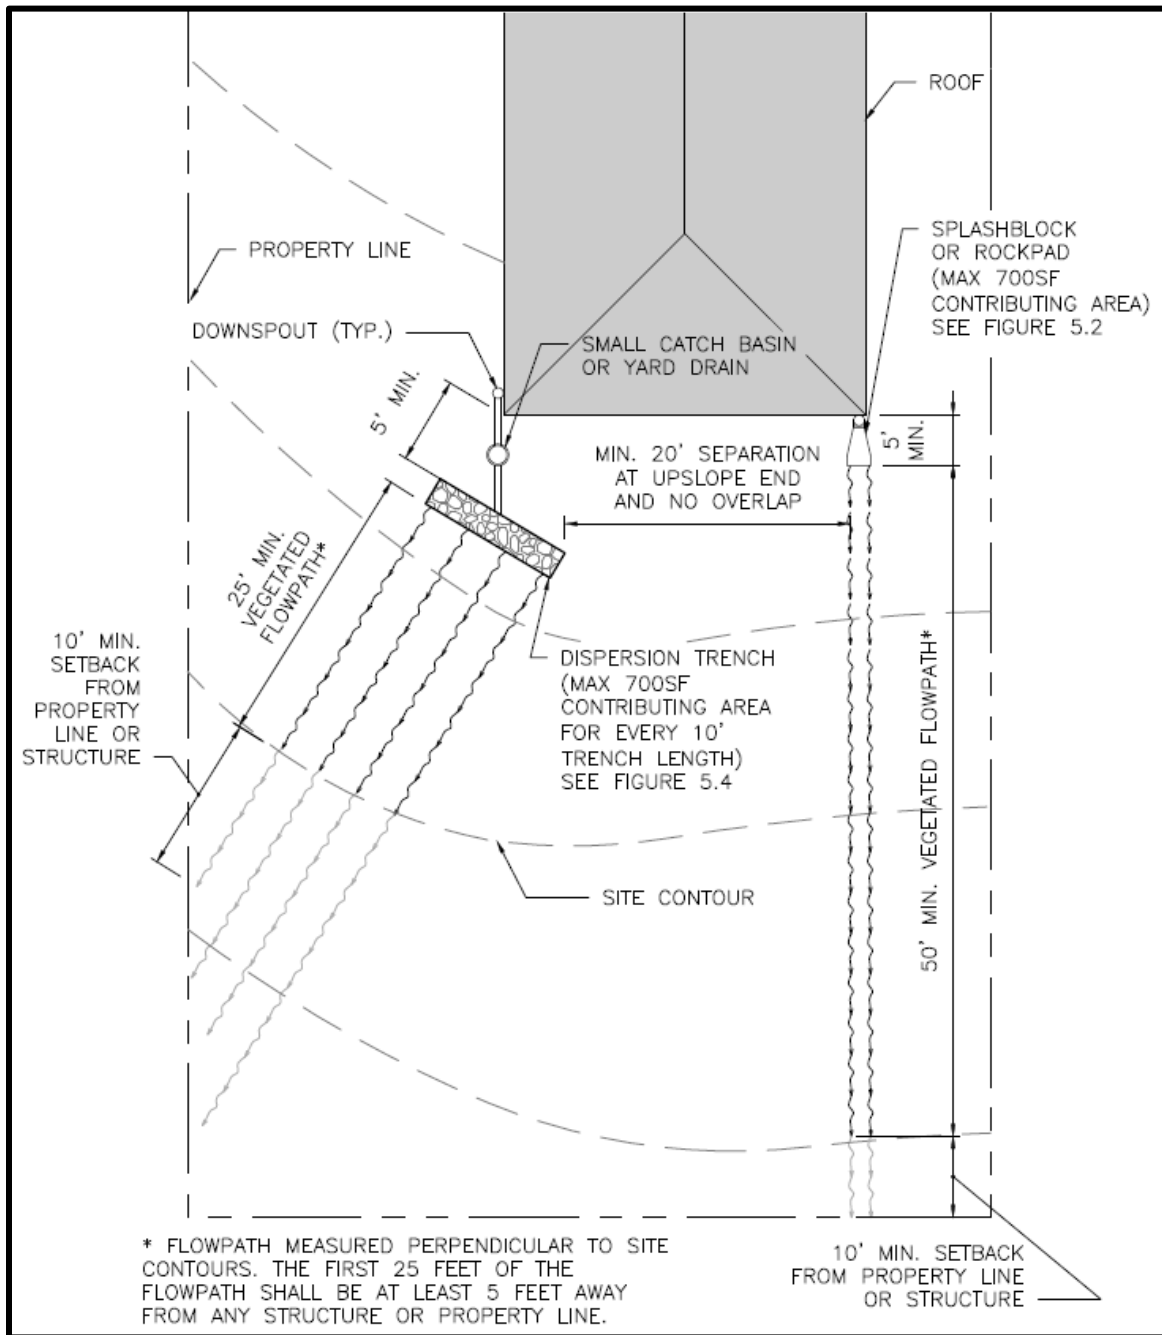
Typical Downspout Splashblock and Dispersion Trench Plan.
